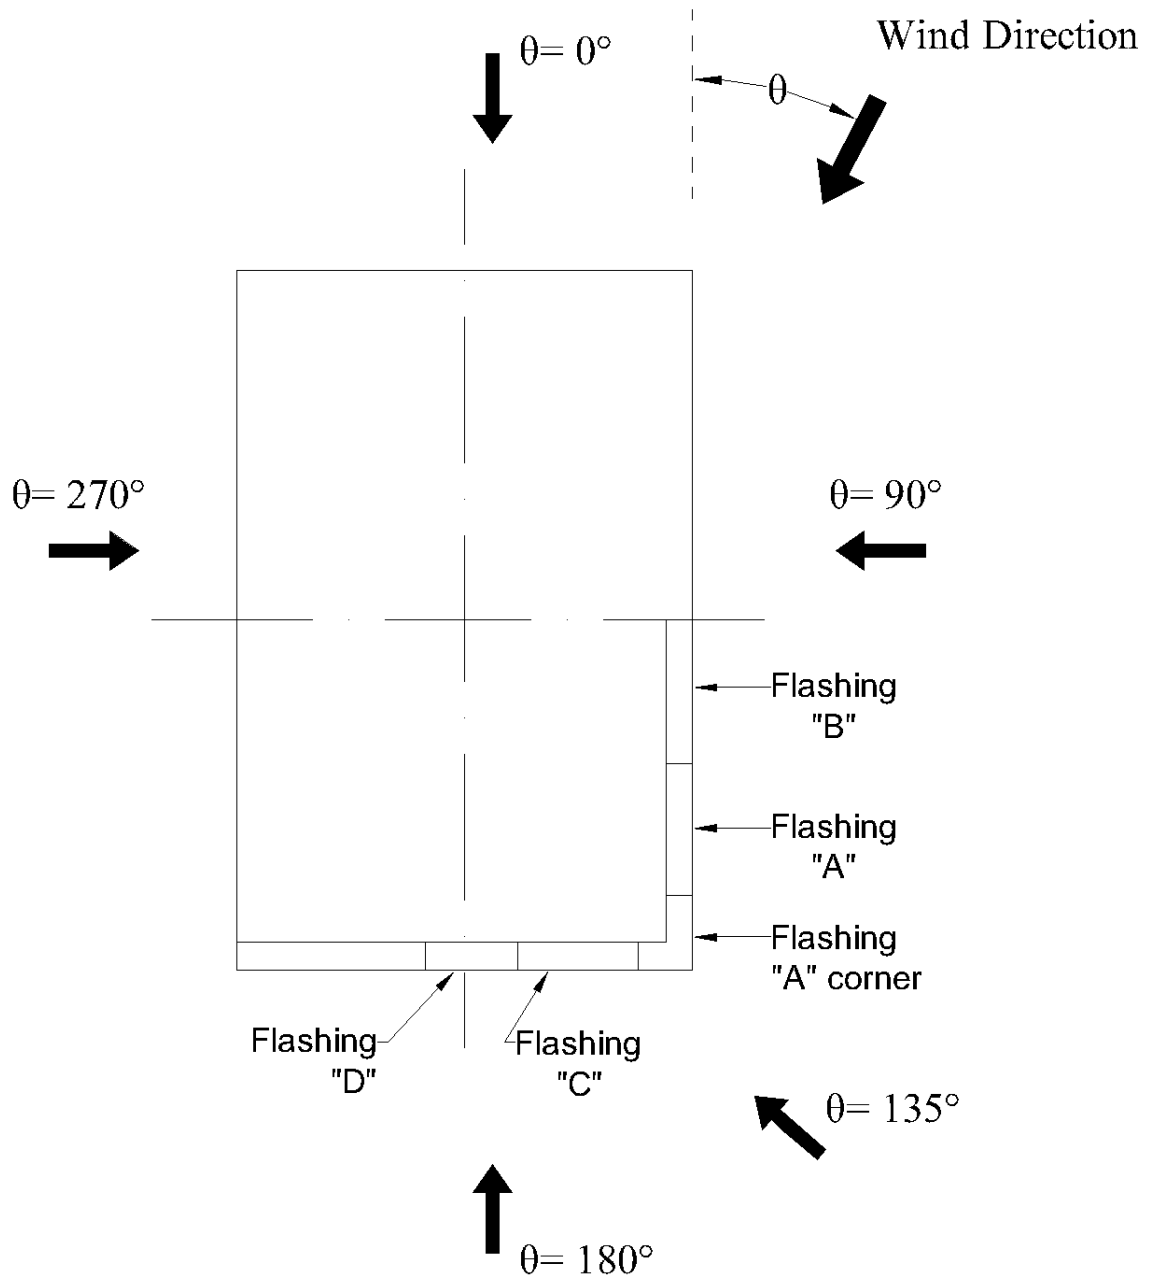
Test building plan and flashing locations (Jiang, 1995)
